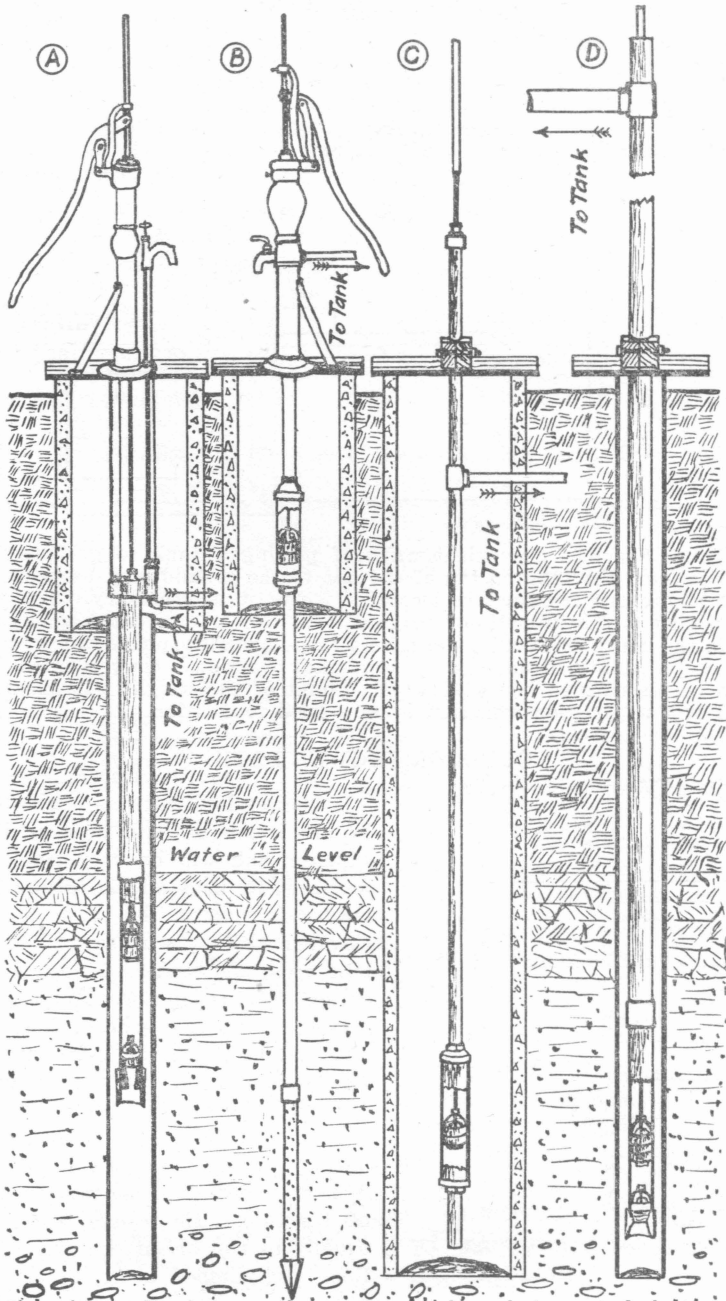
Pumps for forcing or lifting water to supply tanks, for use with a wind-mill or small engine.
